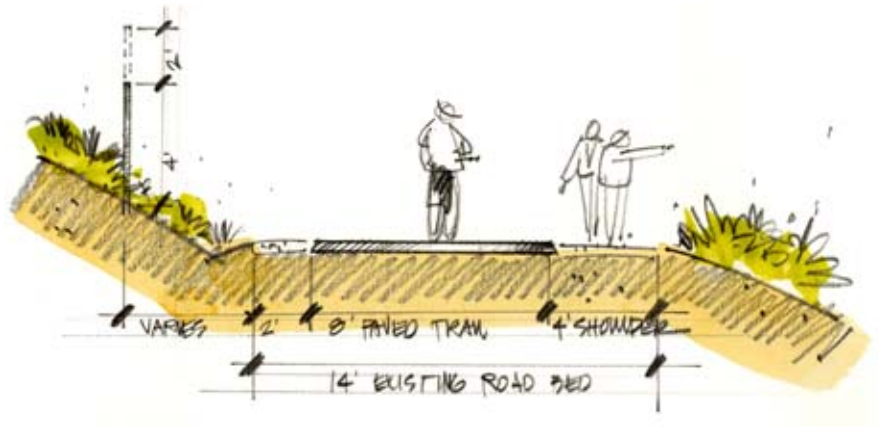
Paved Multi-Use Trail in Landfill on 14' Road Bed
